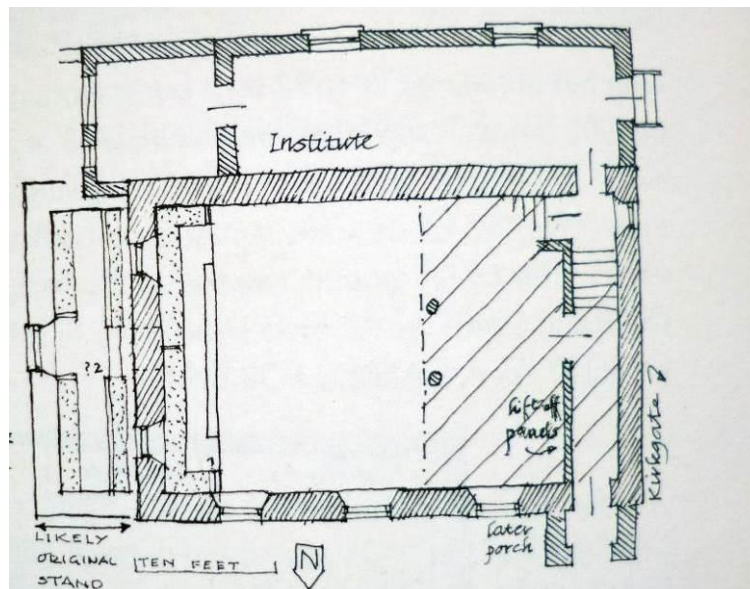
extract from Butler with reconstruction plan, 1999, p828 (north is to the right)
